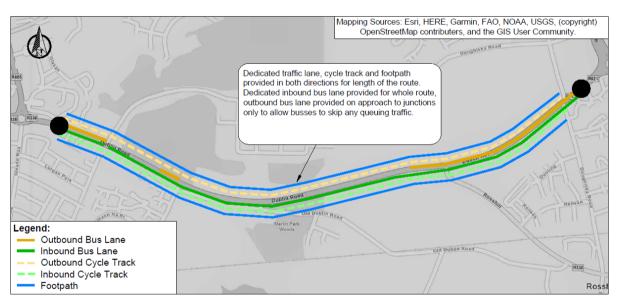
Section 2 Option 5 Indicative Scheme Design
